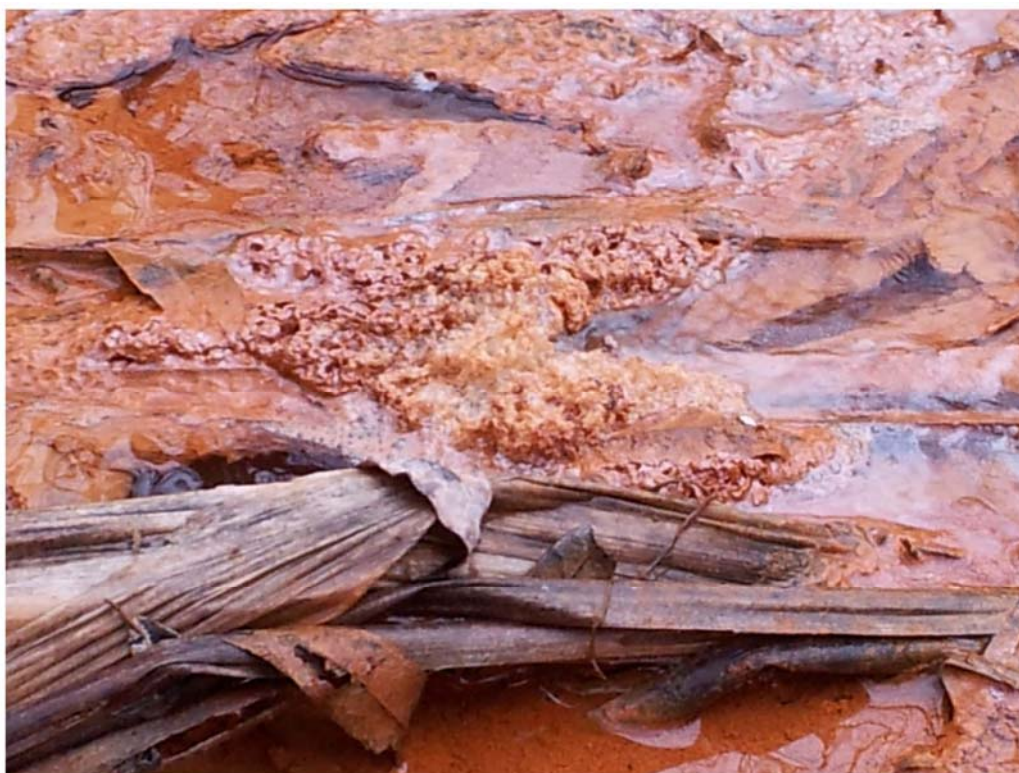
DSCN0939: Chaparral Gulch Dam
